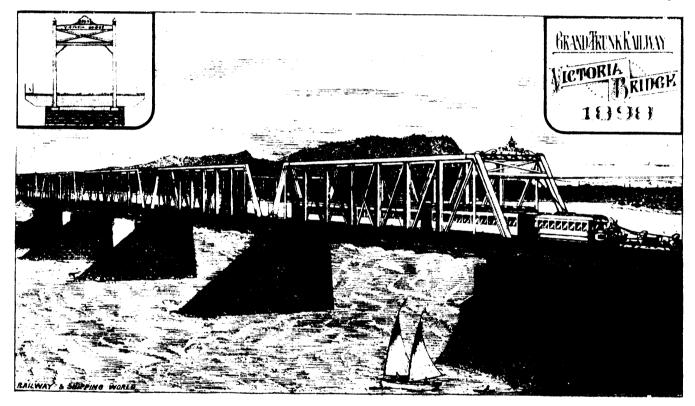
ABUTMENT AND END SPANS, VICTORIA JUBILEE BRIDGE.
